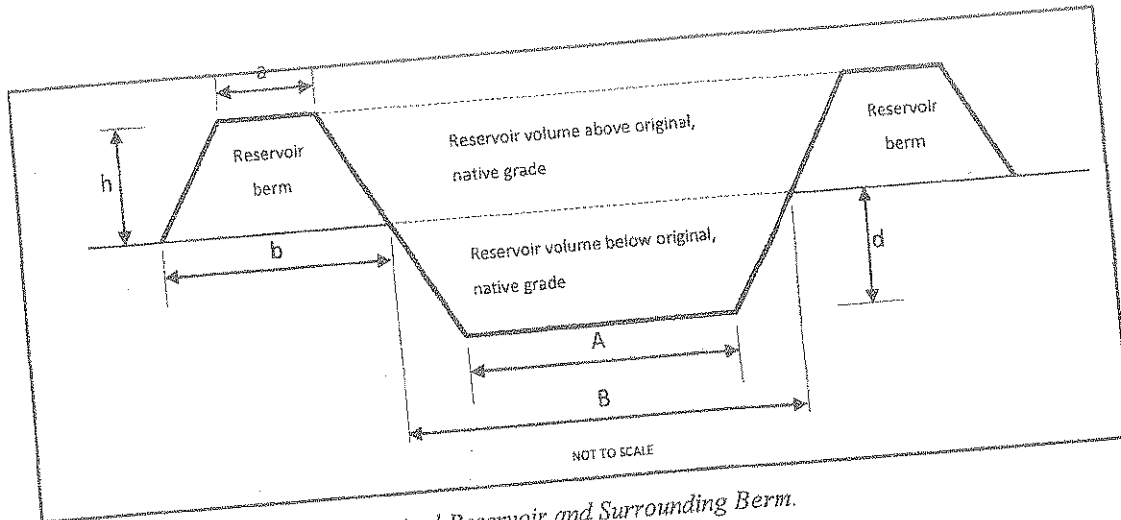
Cross Section of Typical Reservoir and Surrounding Berm.
